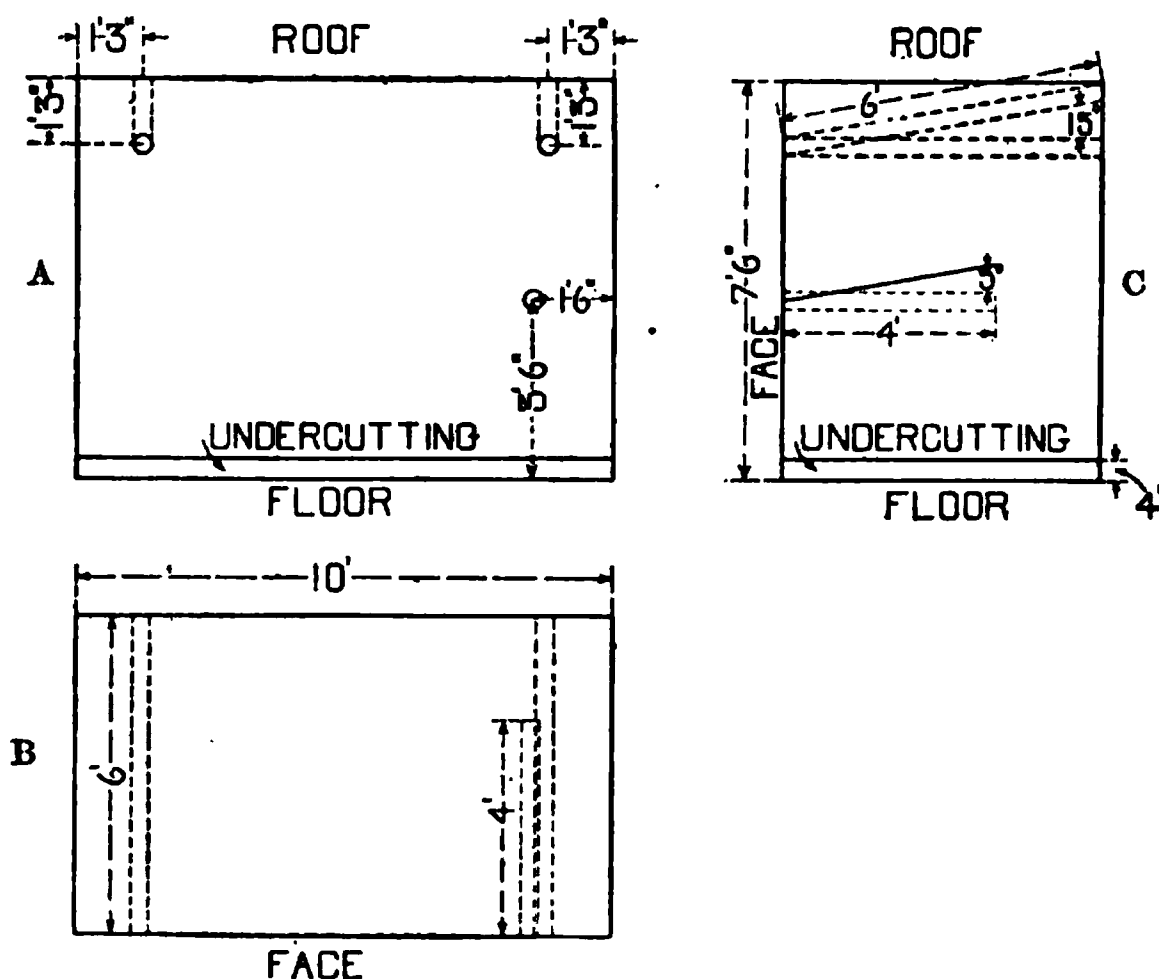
A proper arrangement of holes in a heading with coal undercut. A, front view; B, plan; C, side view.
